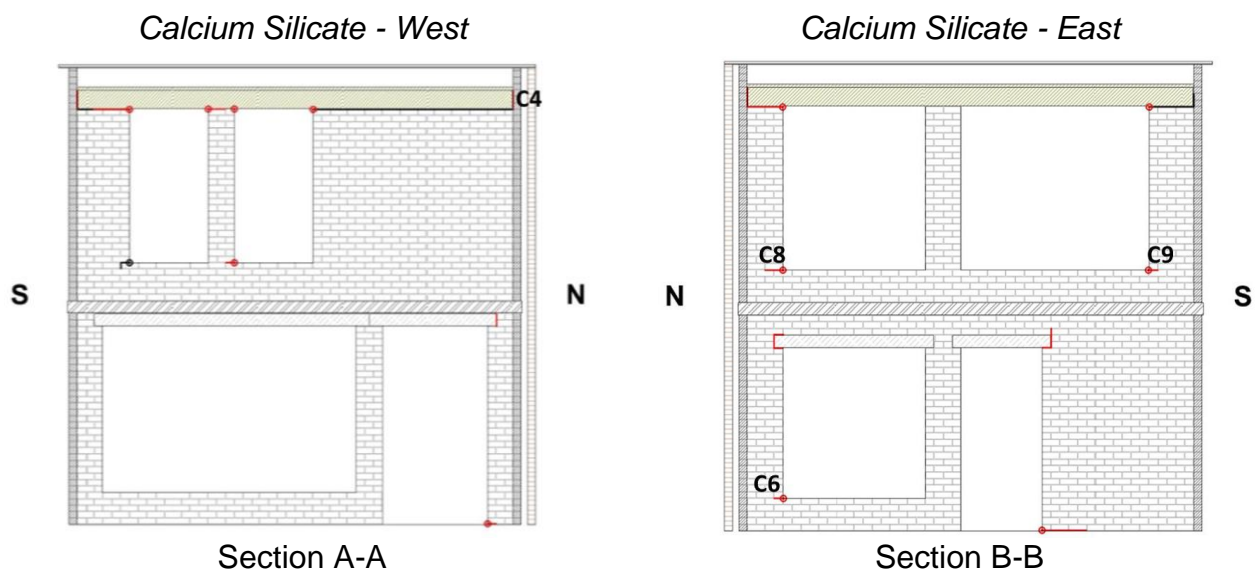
EQ-NPR 50% cracks - Calcium silicate longitudinal walls.
